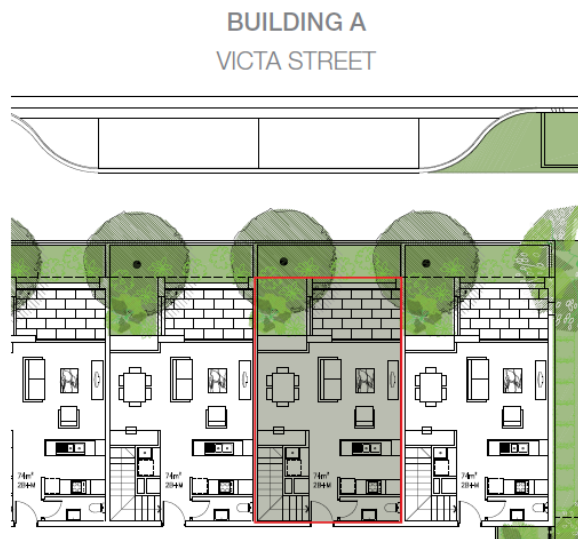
Indicative floor plans and sections of two storey apartment arrangements fronting Victa Street, Tedbury Street and Mackinder Street
